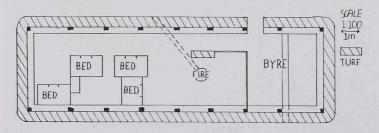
Highland Folk Museum 'creel-house' plan showing the interior layout. (Drawing courtesy of Donald Noble)
